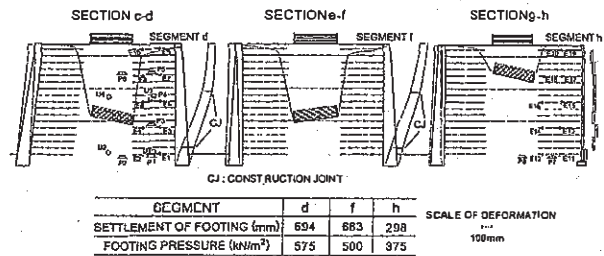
Deformation of three sections of JR No.1 test embankment by loading test
